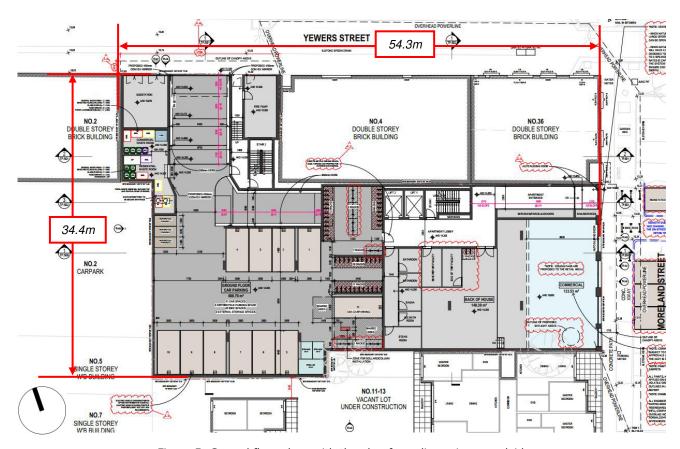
Ground floor plans with the plan-form dimensions overlaid.
